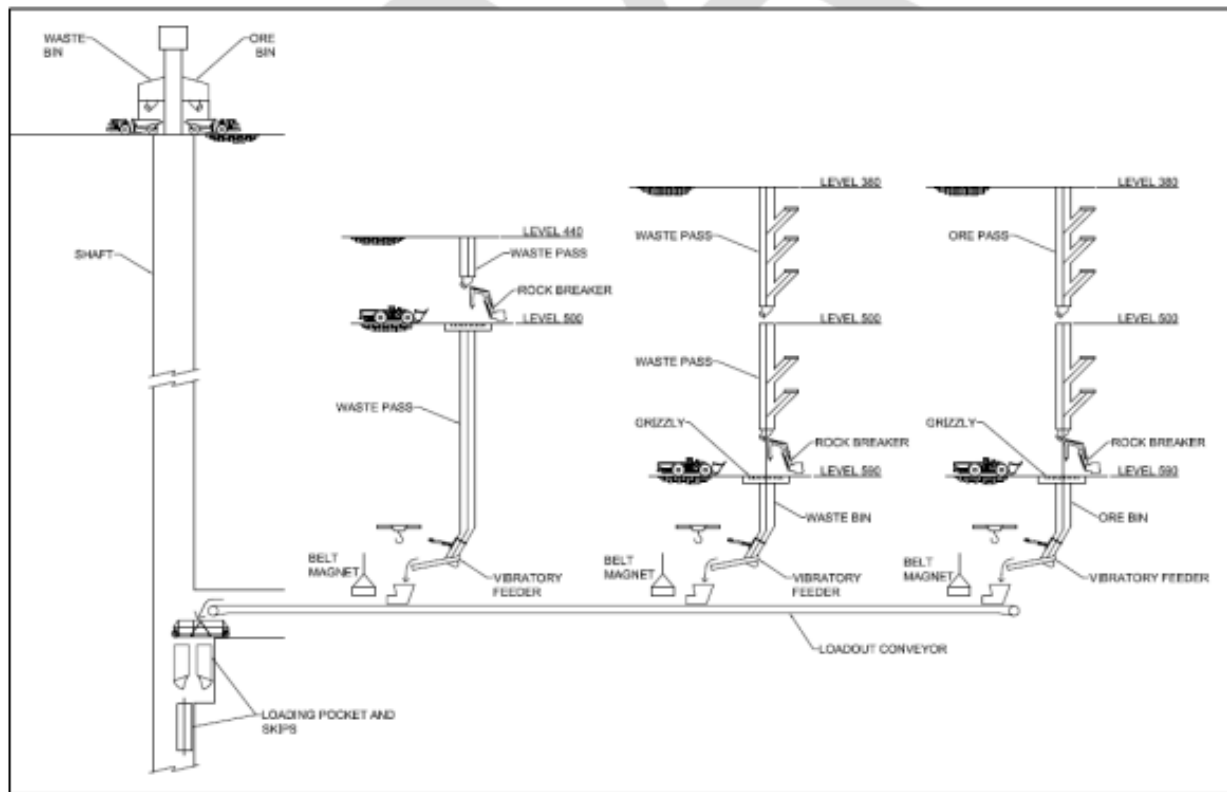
Schematic of Ore and Waste Rock Handling Systems
